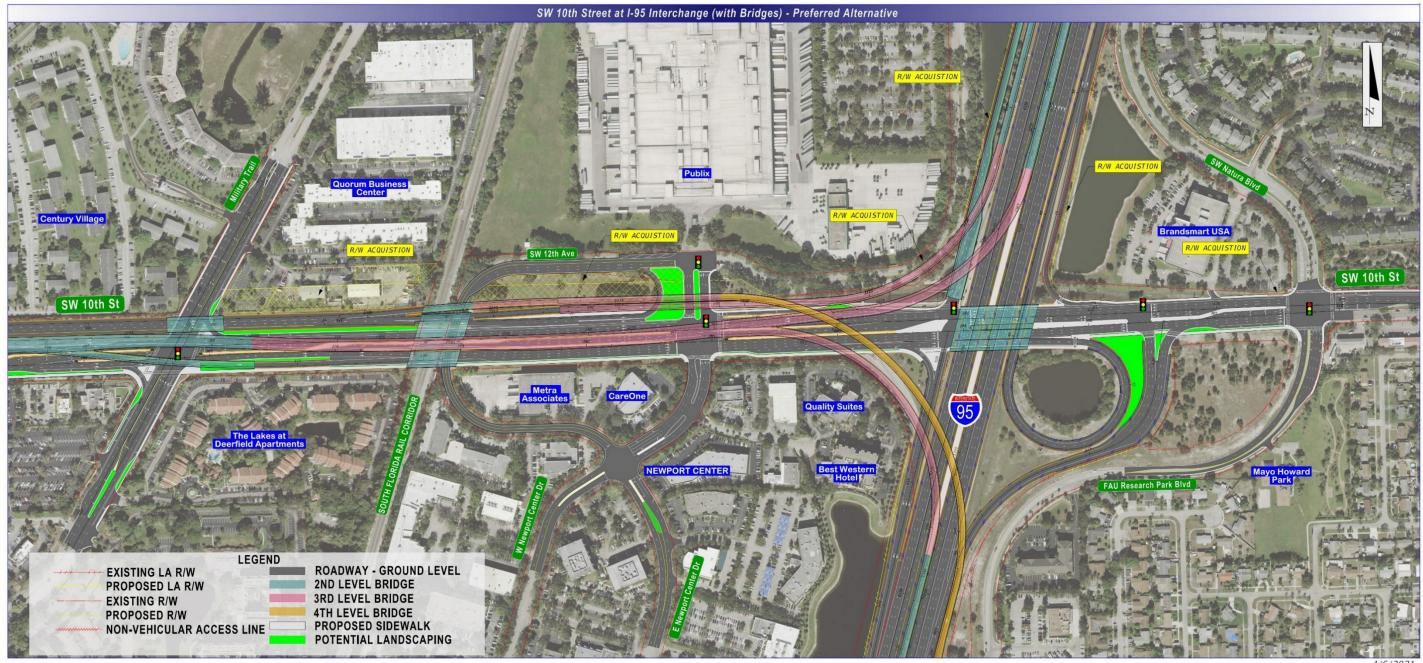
5: SW 10th Street – North Alignment Concept Plans (1 of 2)
